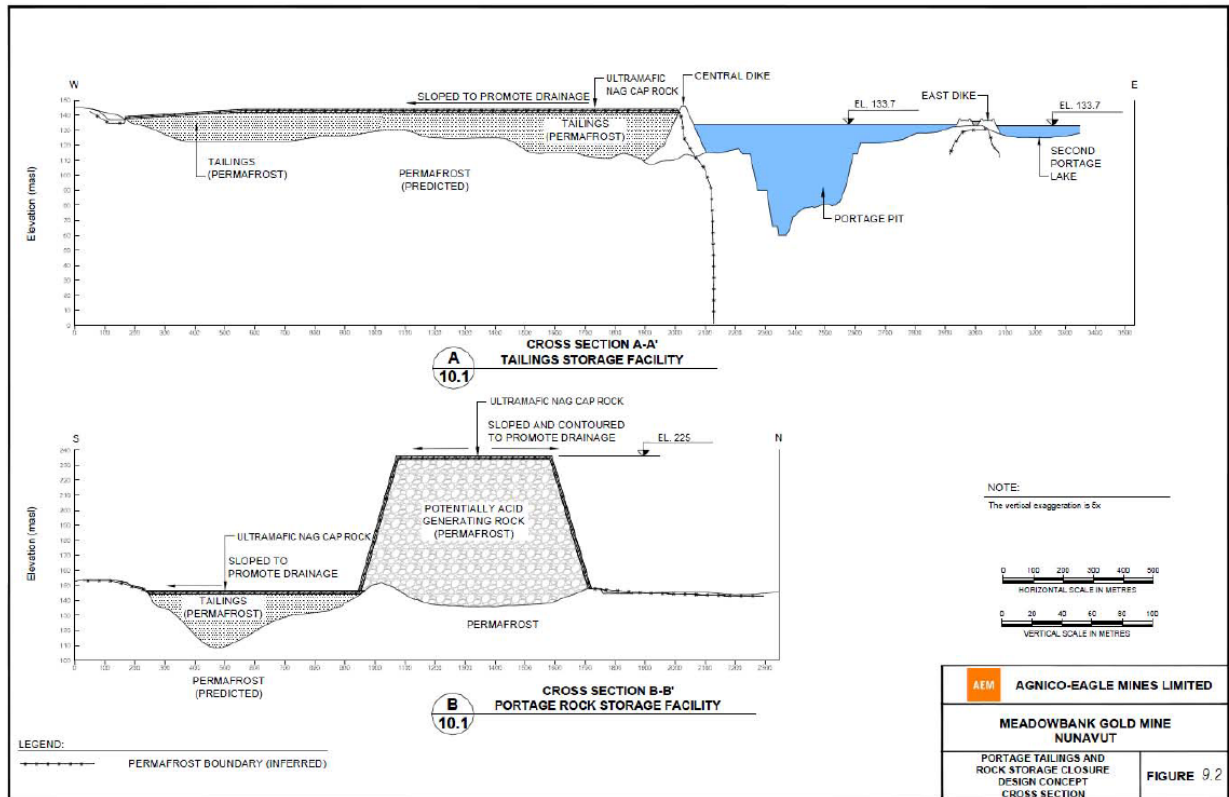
Portage Tailings and Rock Storage Closure Design Concept Cross Section
